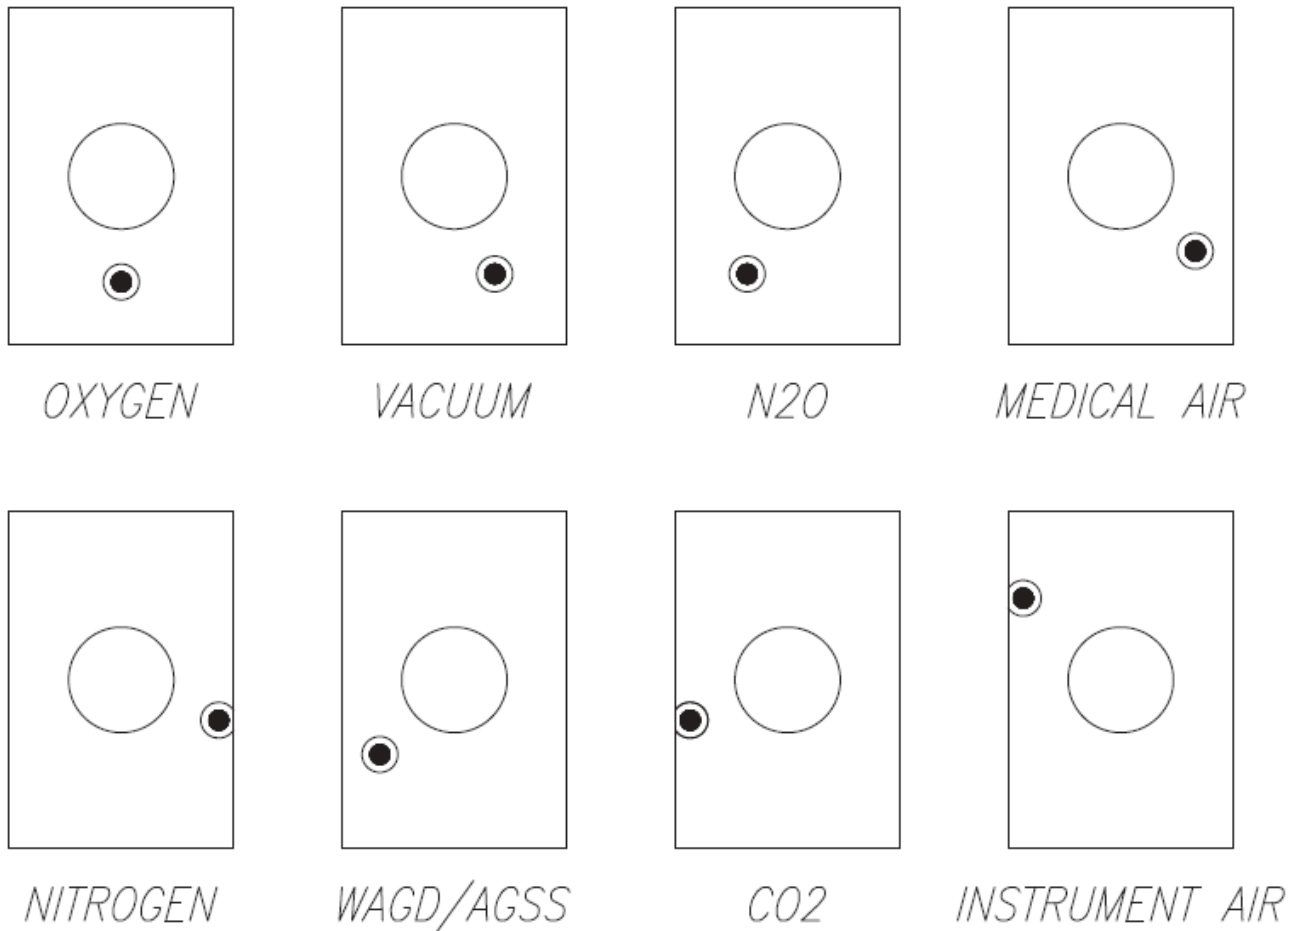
Example of a rough-in assembly pin index system [\[Image Description\]](#)
